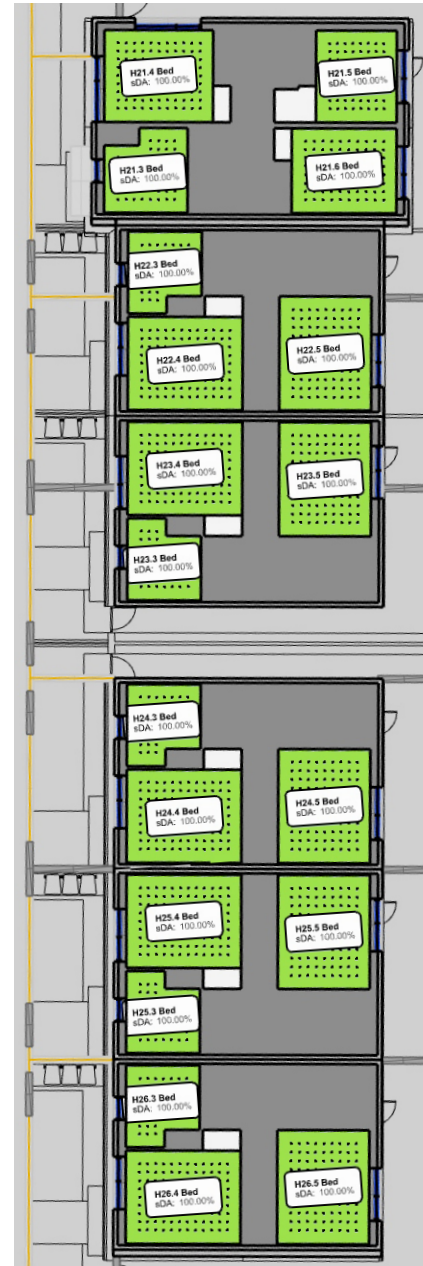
Floor plans indicating Daylight Provision to BS EN17037:2021+A1 Table NA.1
